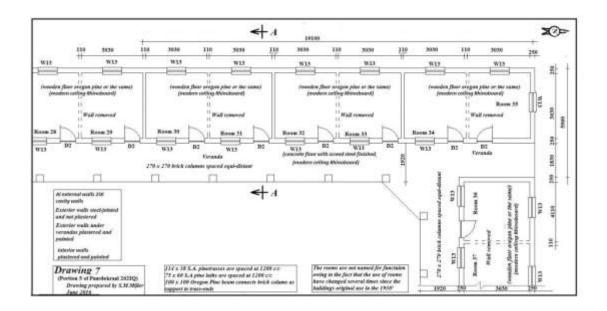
Above. Layout of rooms 28 to 37 in drawing 7 (Drawing S.M. Miller 2016.)
